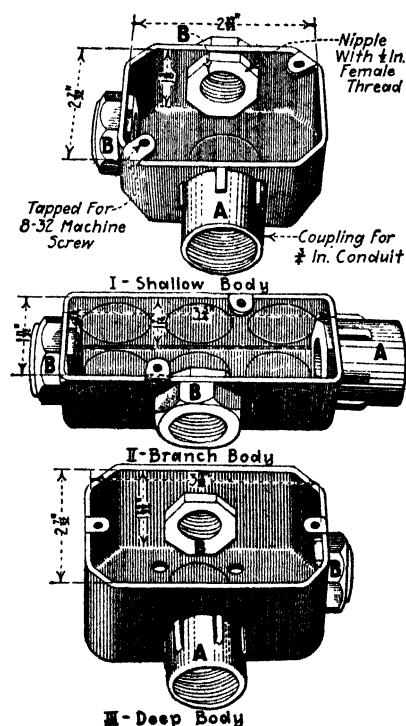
Showing outlet fittings of the knockout type. The dimensions of the boxes may vary $\frac{1}{8}$ 2-in. from those shown. The sheet steel used for the making of these boxes is 0.080-in. thick. Several different concerns manufacture this line of fittings.
